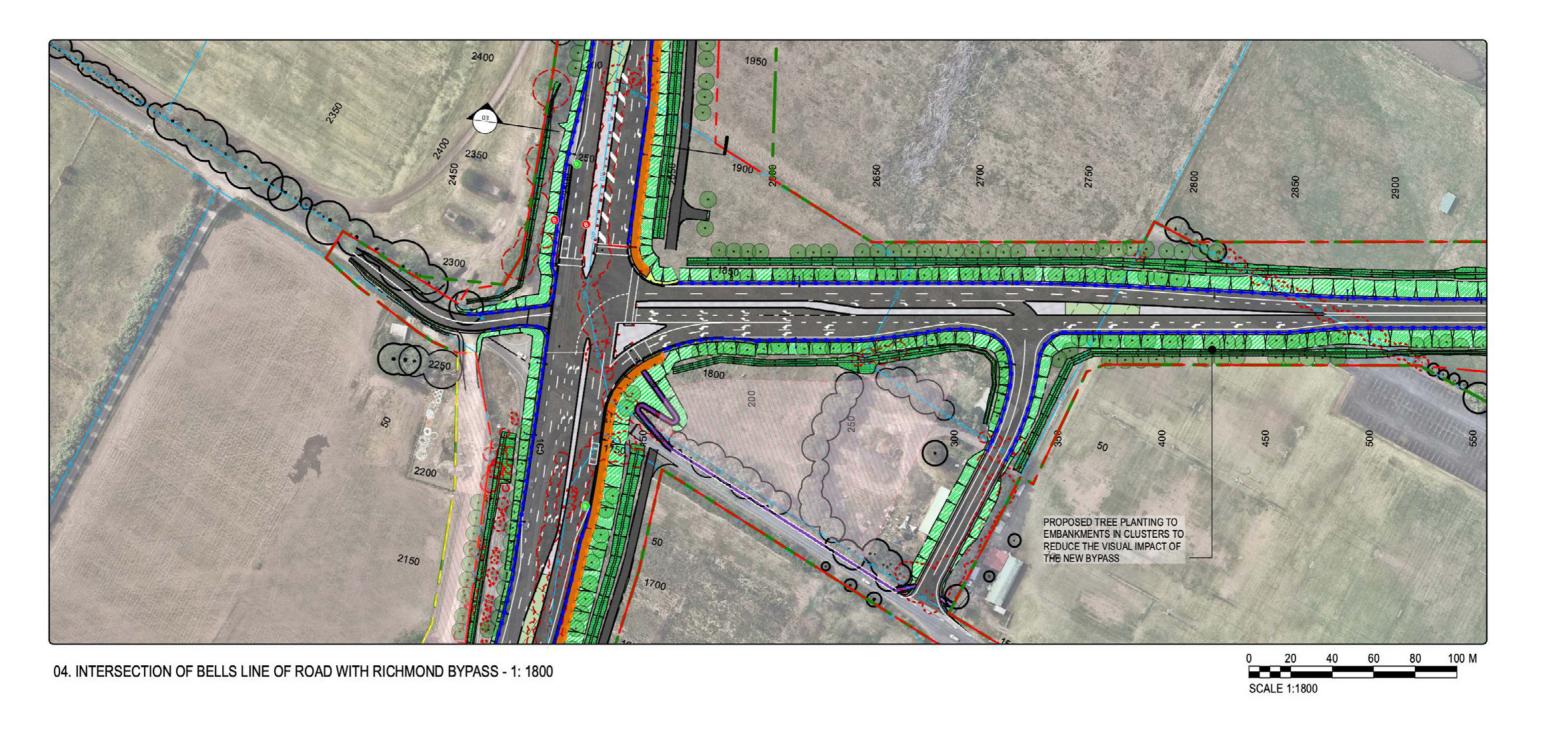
Stage 2A urban design plans - sheet 4 of 7
